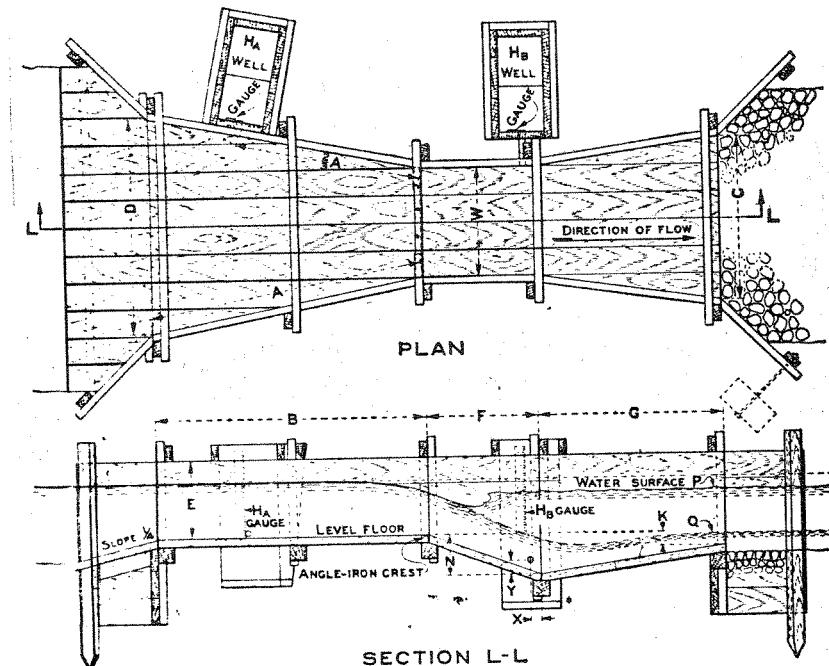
Plan and elevation of the Parshall measuring flume
